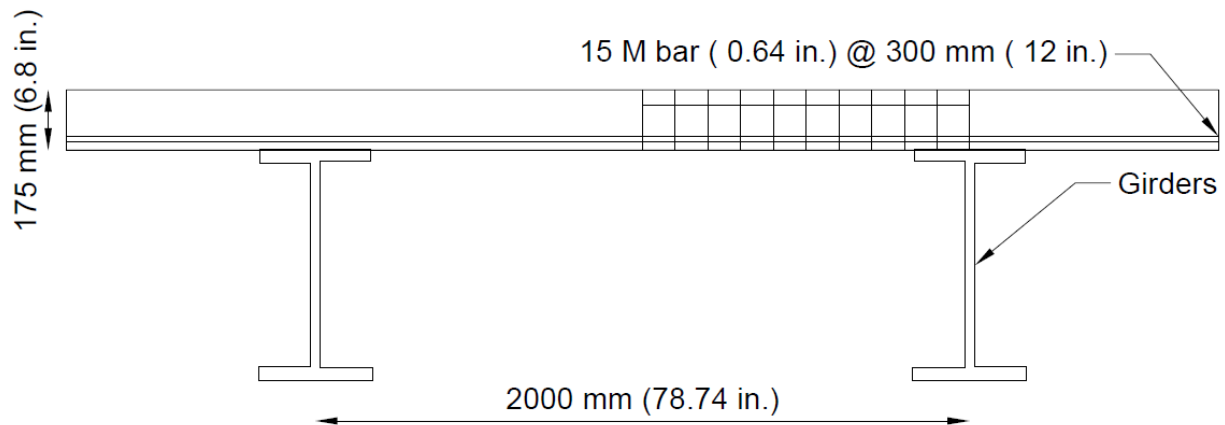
The reinforced concrete slab shows idealization in half section.
